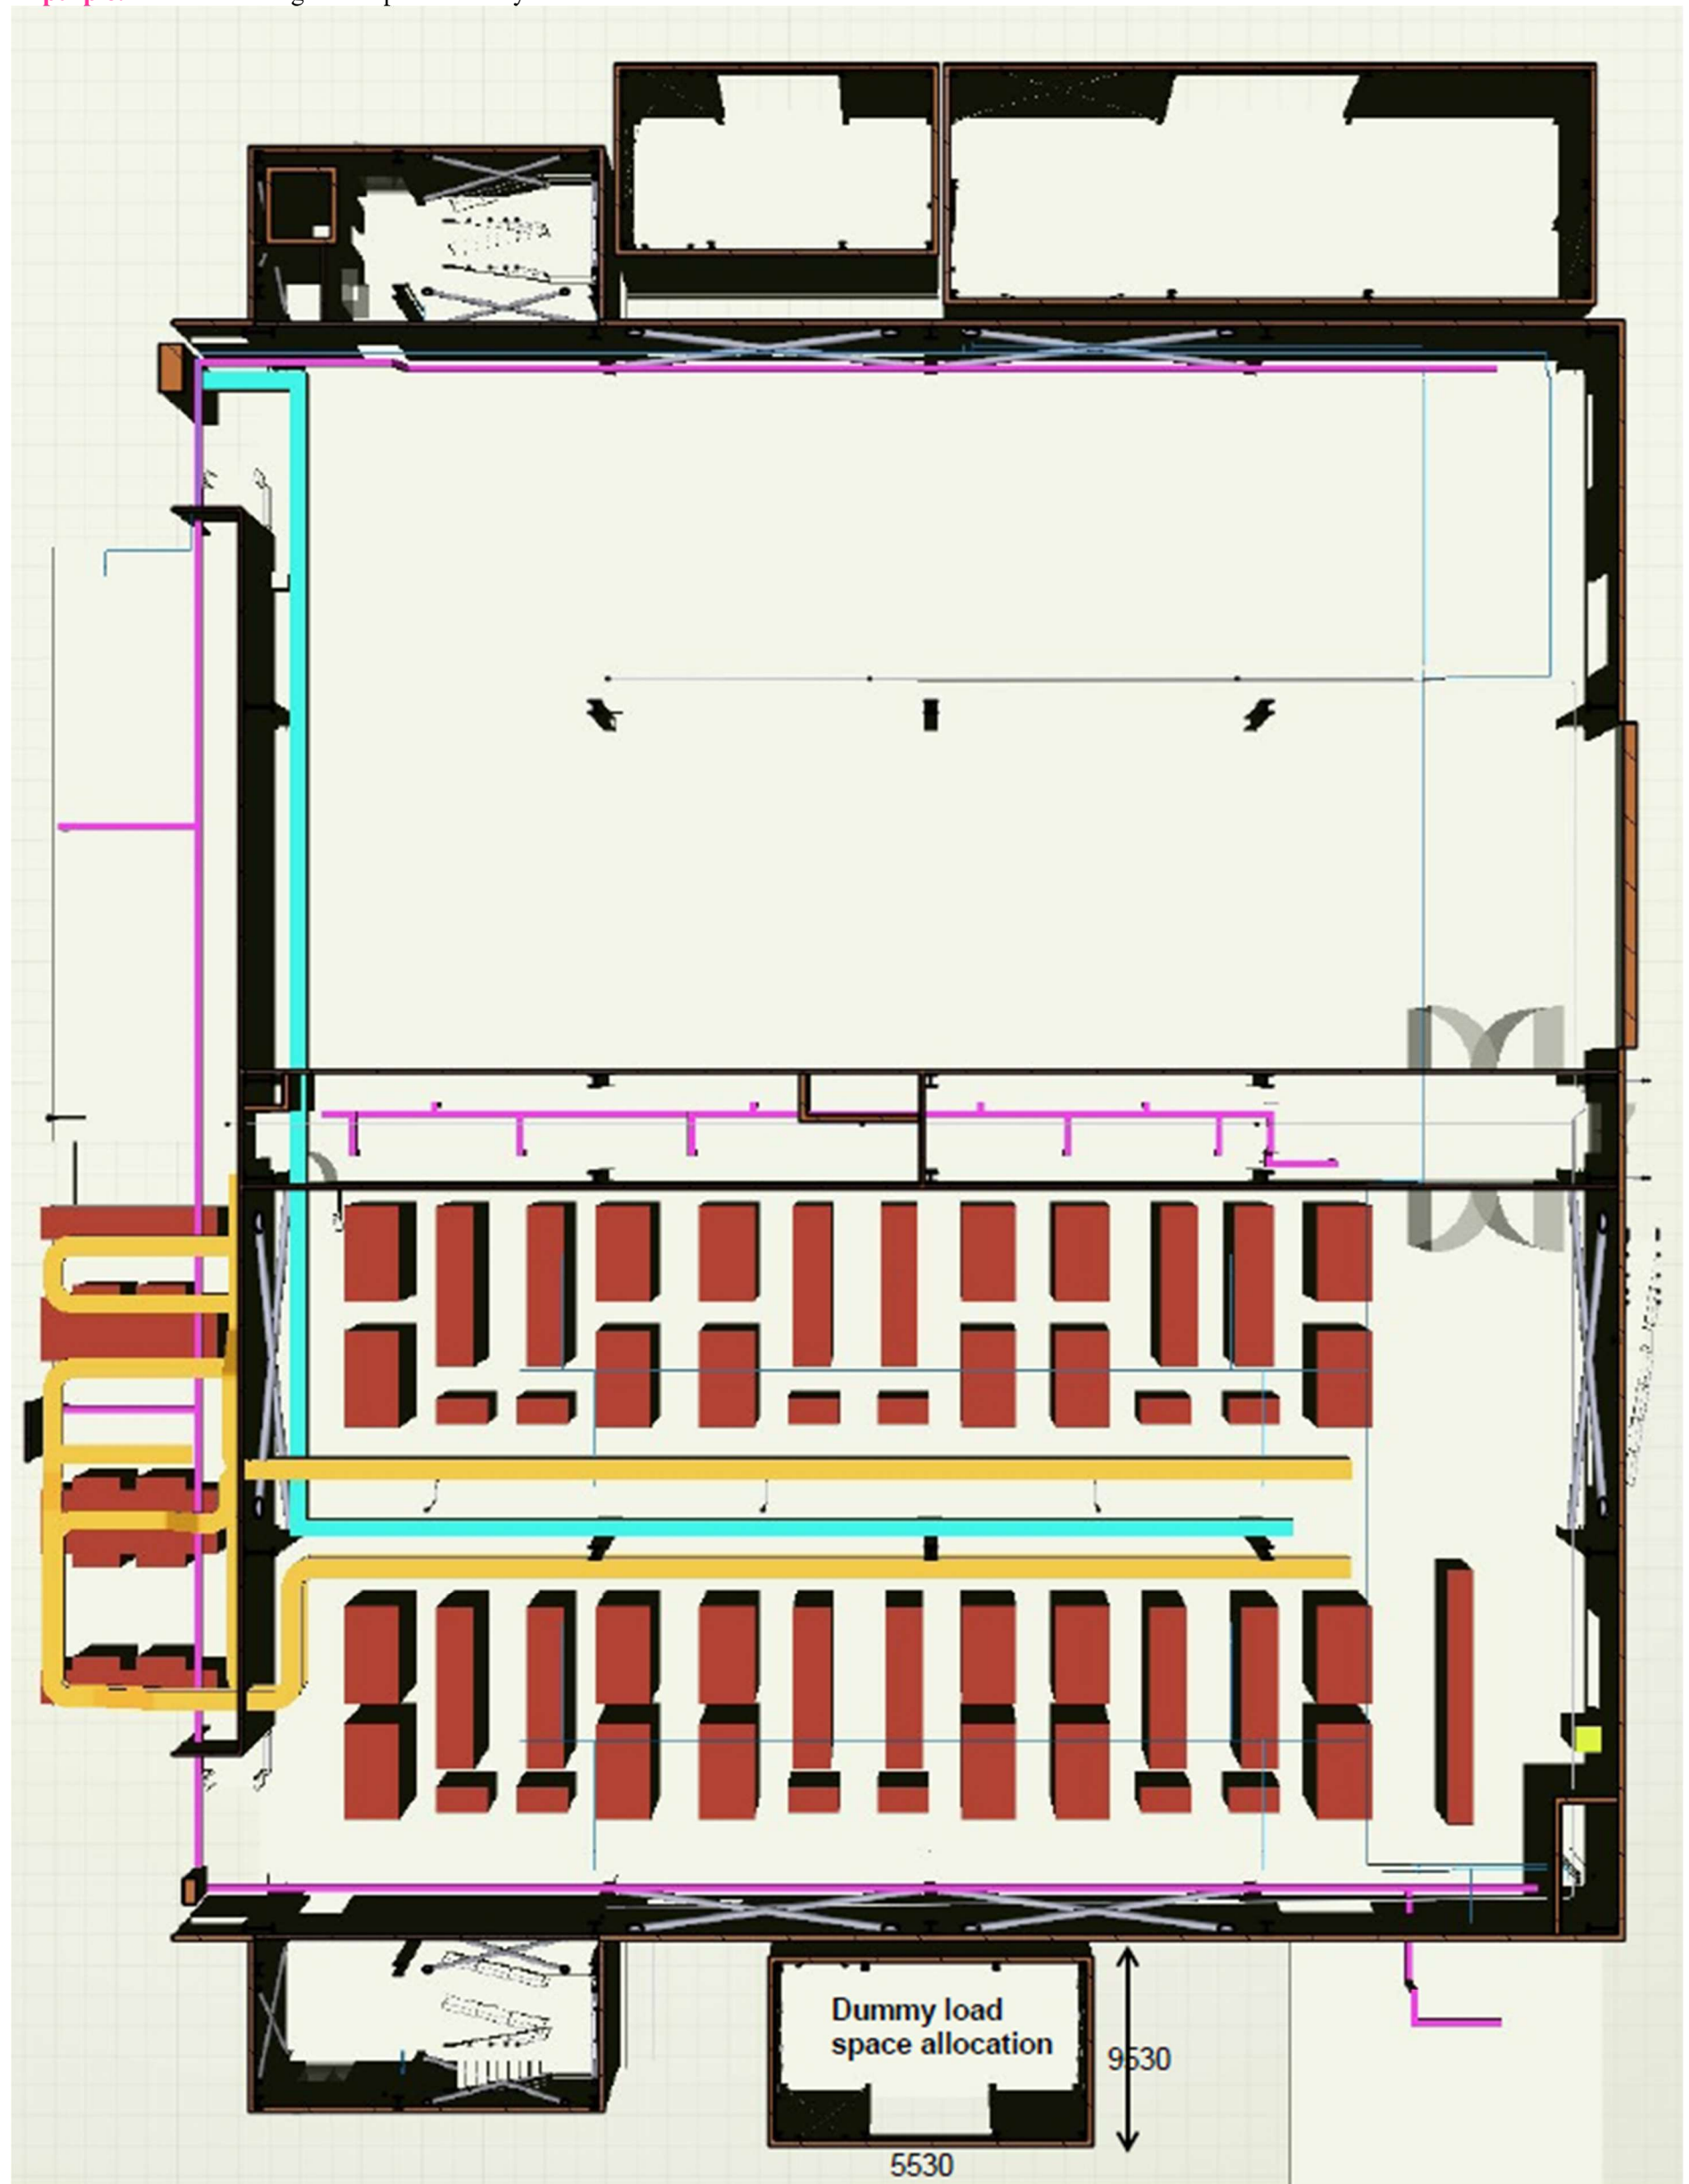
Building 15 Layout EC MHVPS ground level (L1) showing main interfaces
